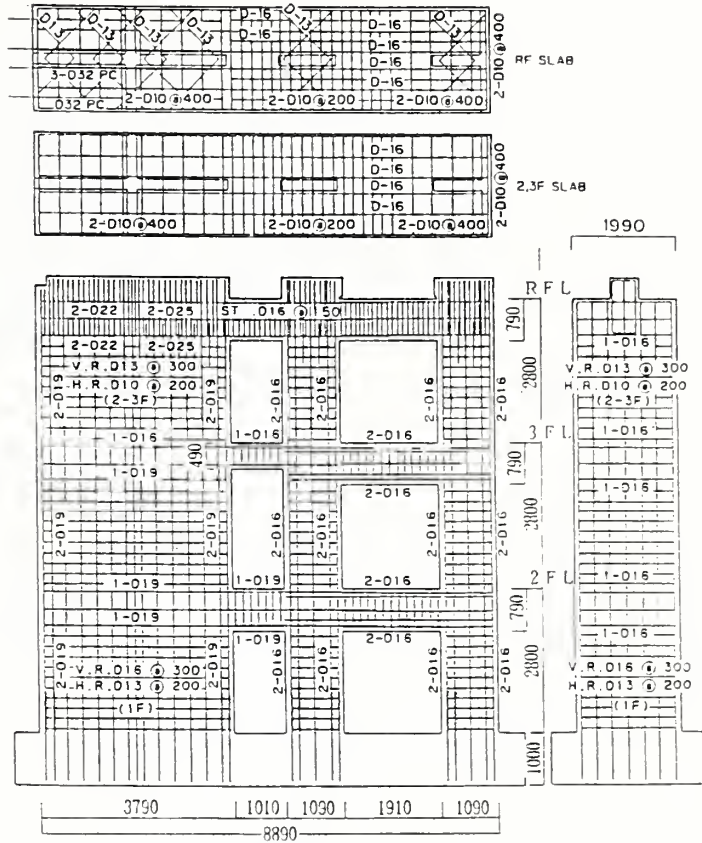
a) Plan, Elevation, and Reinforcement of Test Specimens
